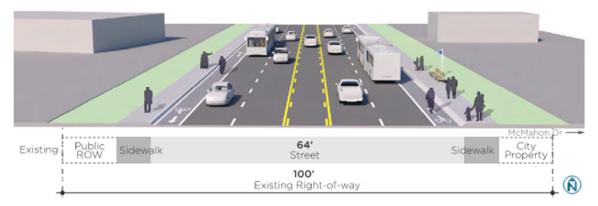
Existing Typical Cross Section: 21st Ave to Florin Rd, Gerber Rd to Elsie Ave
